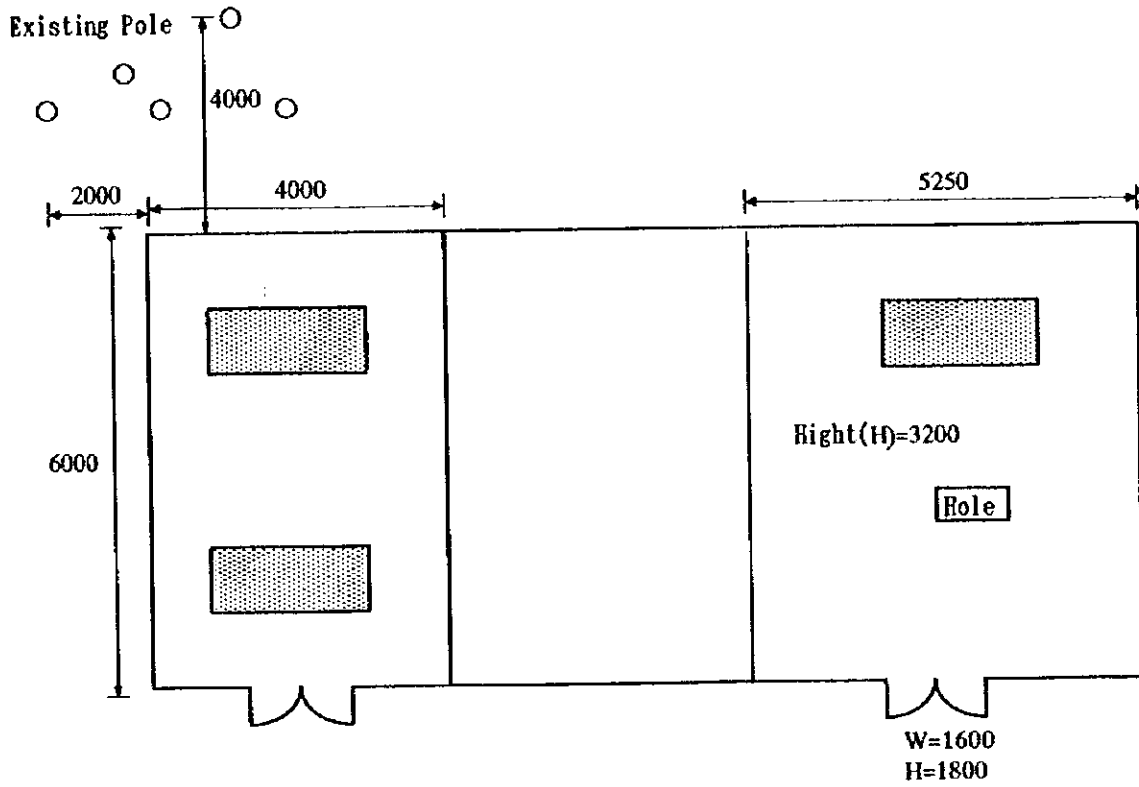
24 Layout Drawing of Khuvsgel
